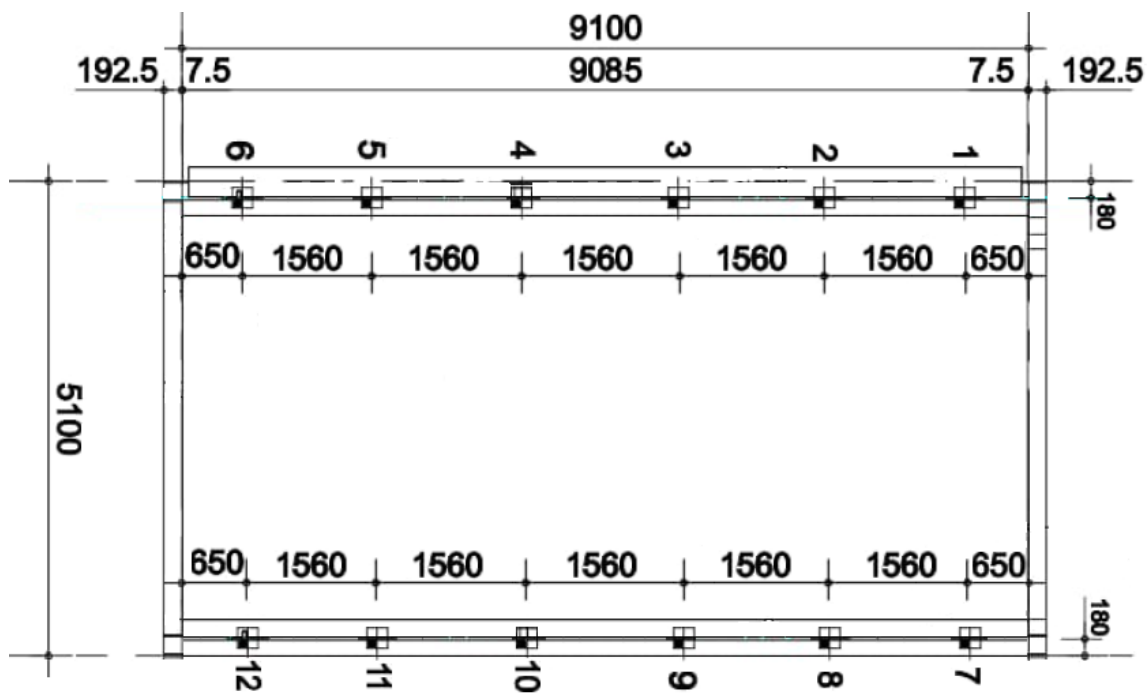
Foundation plan for 12 timber foundation piles (boxes)
